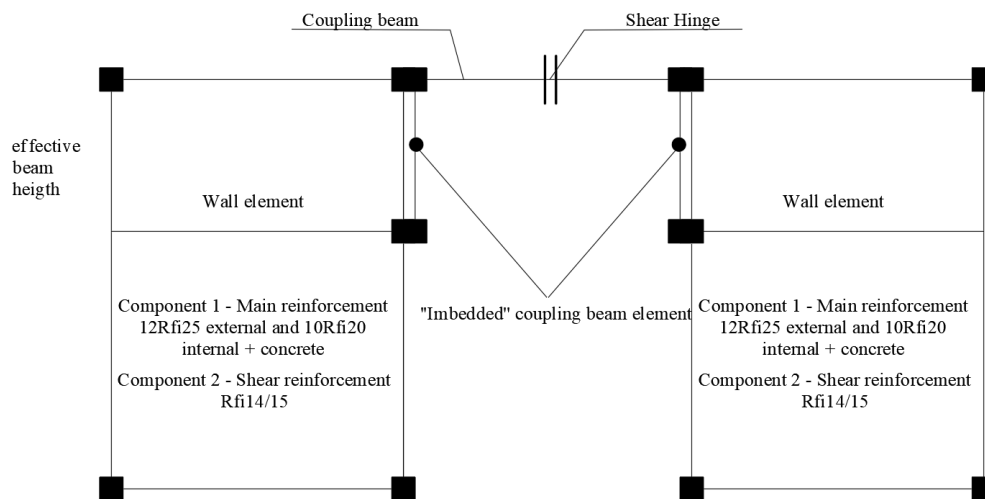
Schematic representation of nonlinear model of coupling wall on first floor
